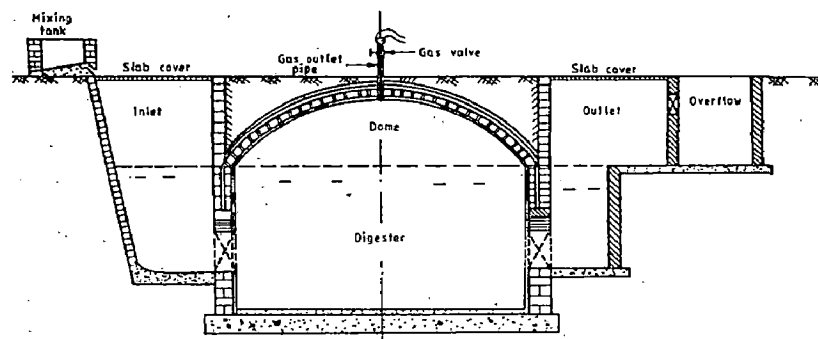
A Typical Fixed Dome Type Biogas Plant [35]
